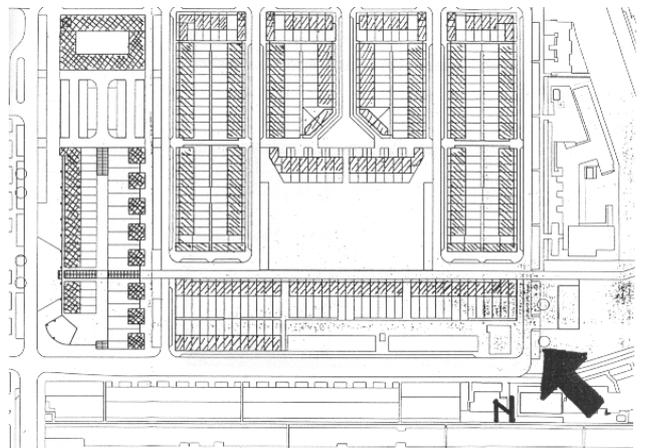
Proposed Site Plan, Schaakwijk, Netherlands.
